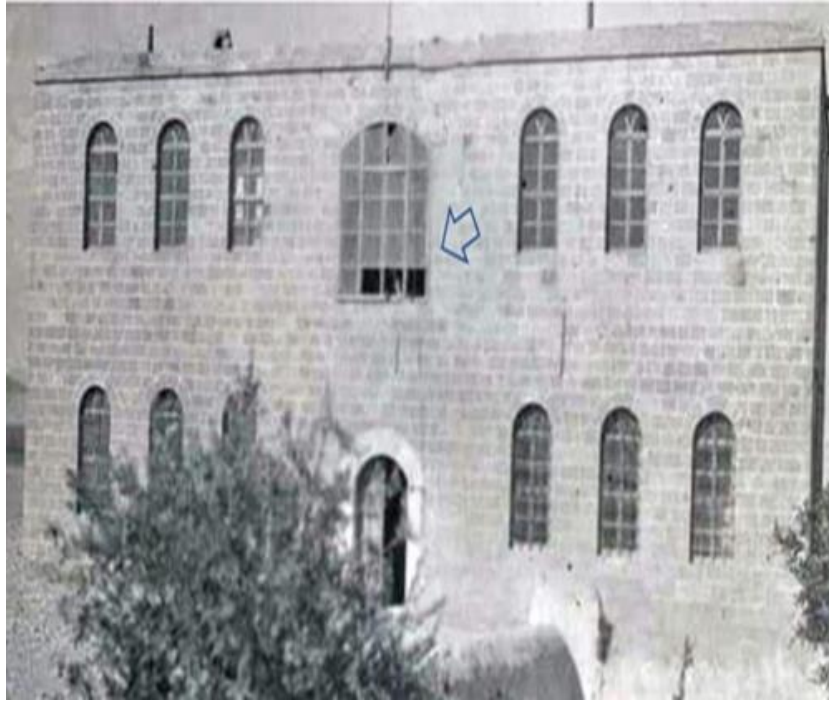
Wooden joinery found in a similar building sample (Former Kızıltepe Government Building)
